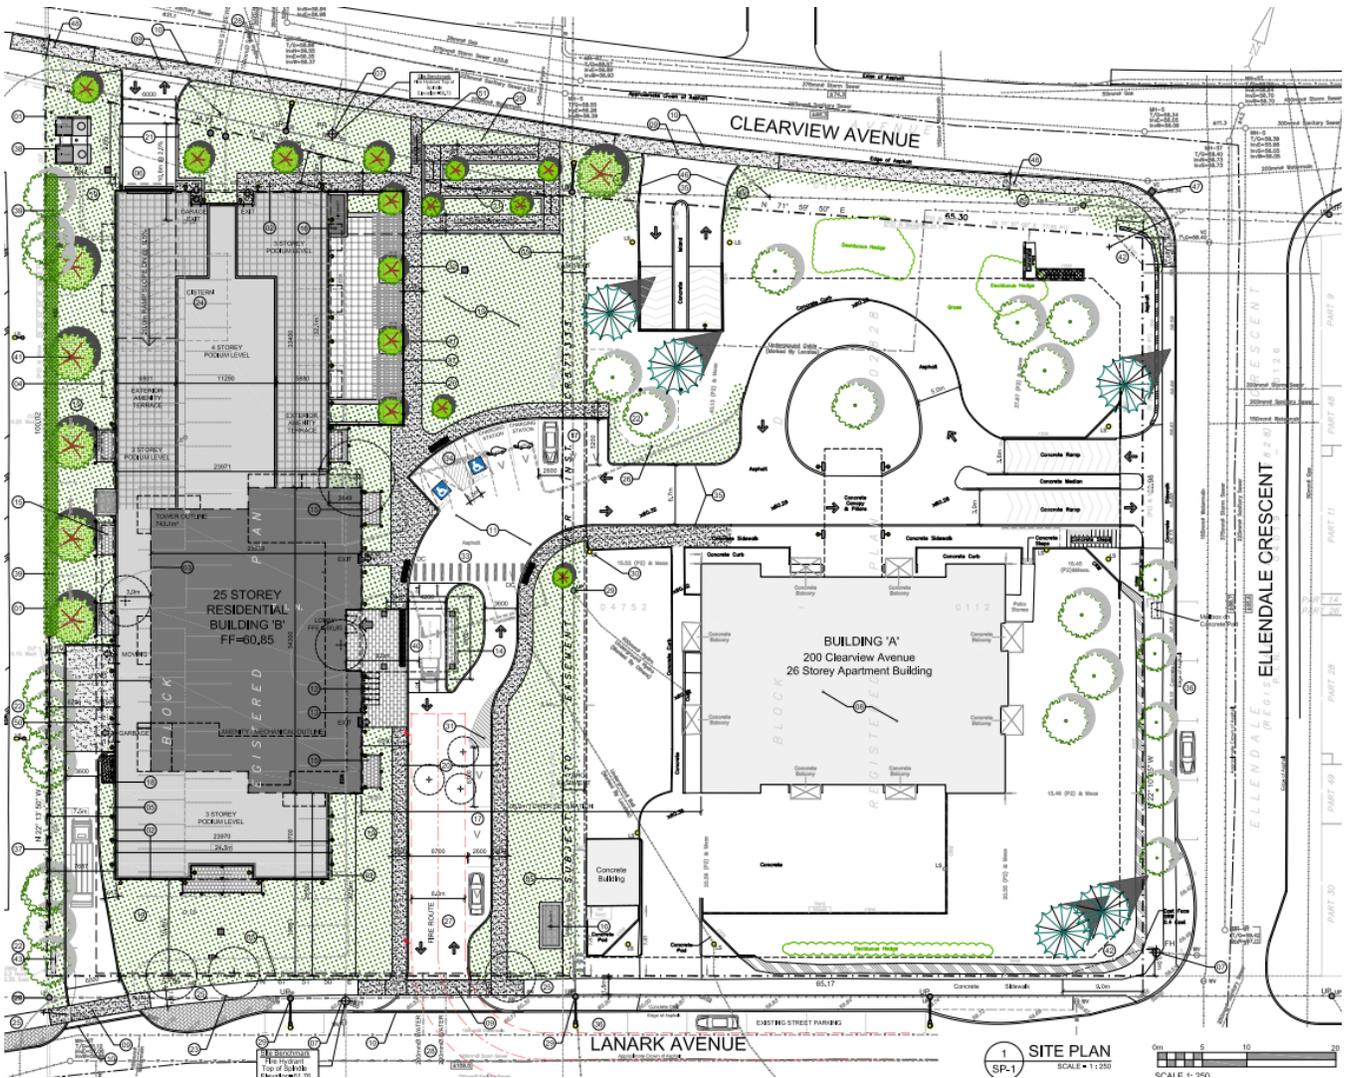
Site Plan of Proposed Development, prepared by RLA Architects
